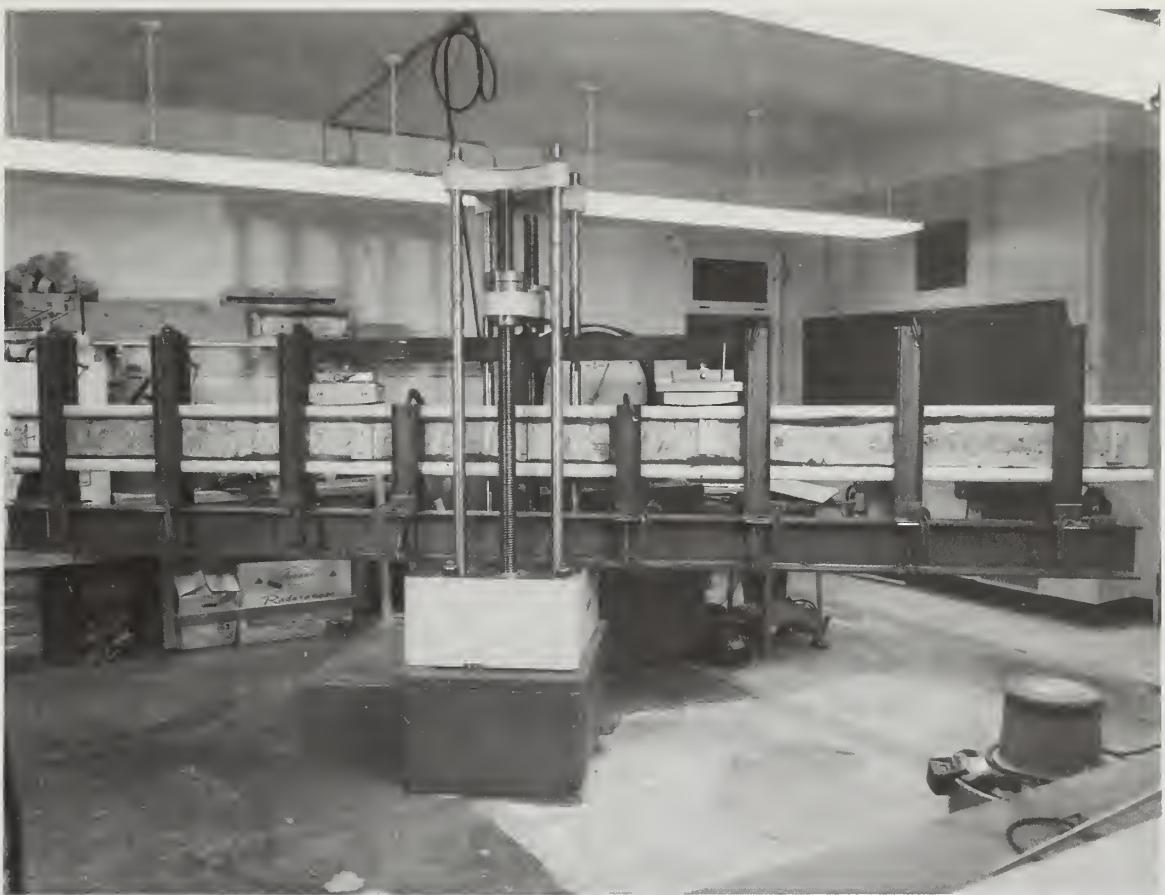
Fabricated pole joist 16 feet long undergoing a destructive bending test with third-point loading over a 15-foot span.
